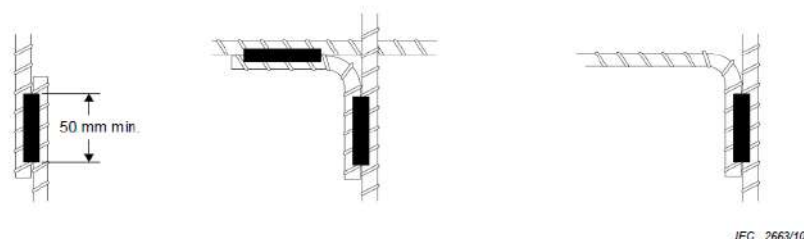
Welded joints (suitable for lightning current and EMC purposes)
